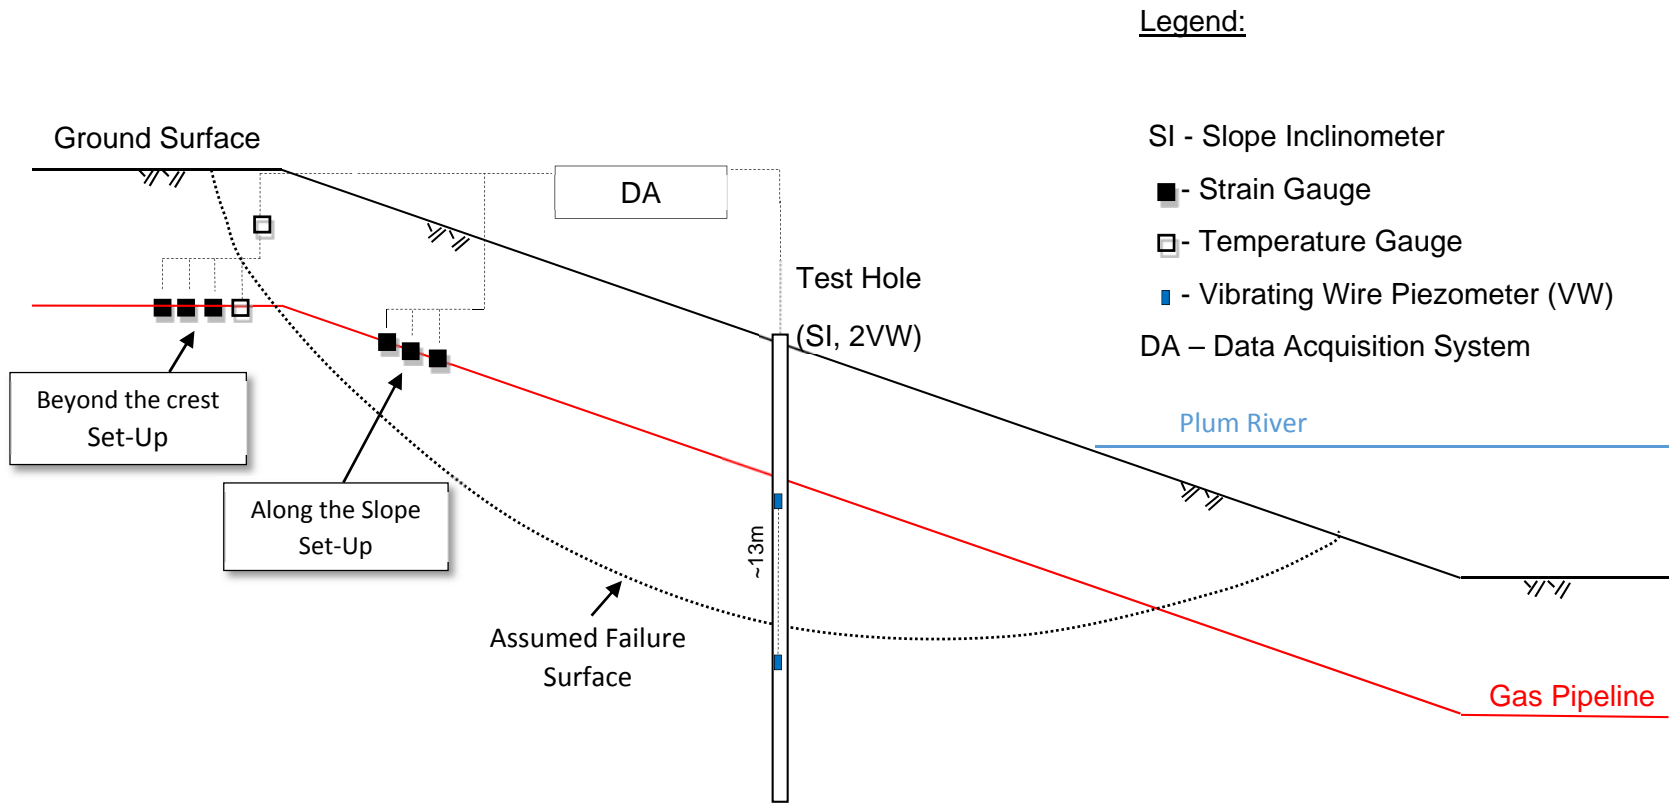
Riverbank Site Test Hole and Instrumentation Layout Schematic (Plum River).
